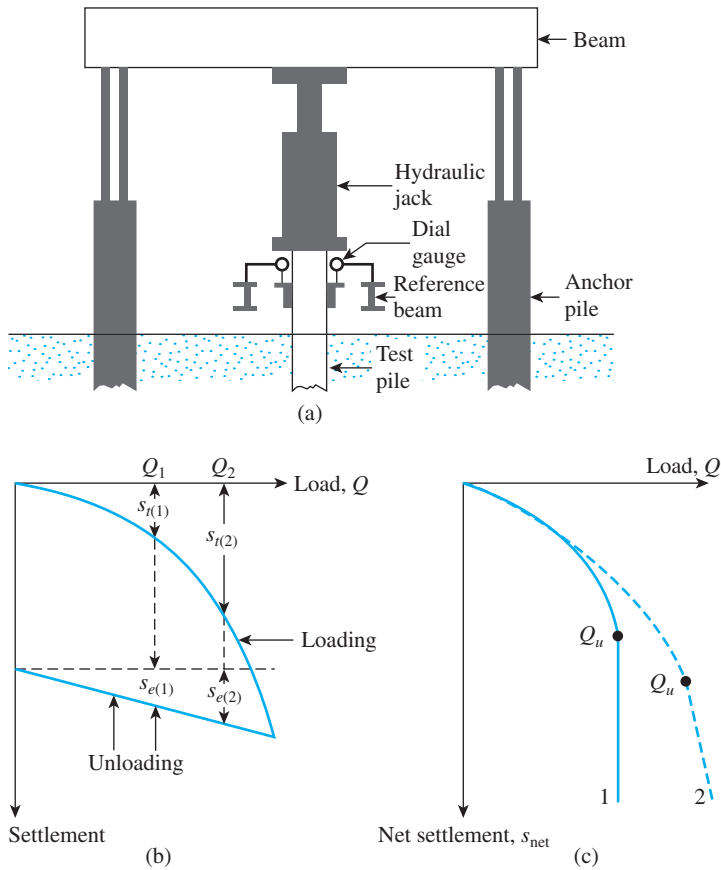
(a) Schematic diagram of pile load test arrangement (b) plot of load against total settlement; (c) plot of load against net settlement
